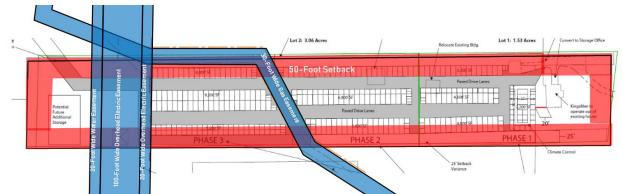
Site Plan Showing Limitations Imposed by Setback Requirements and Utility Easements
